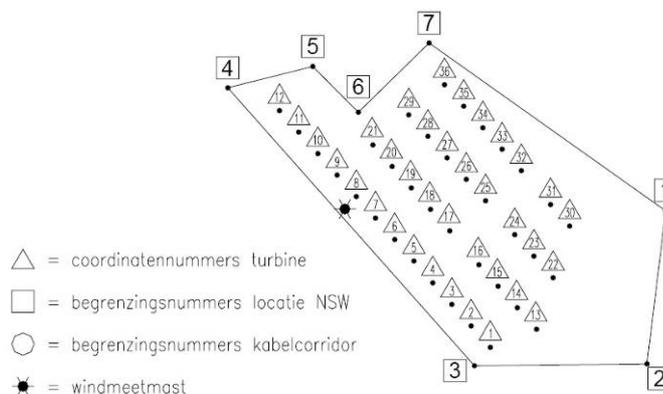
Detailed site layout (source: NoordzeeWind 2003a).
